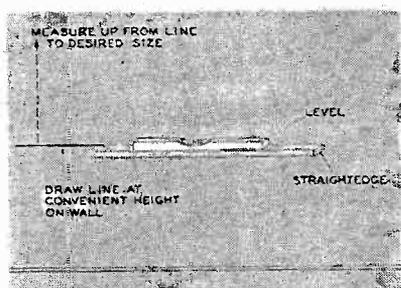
Using a level and straightedge to set line marking height of built-in.
